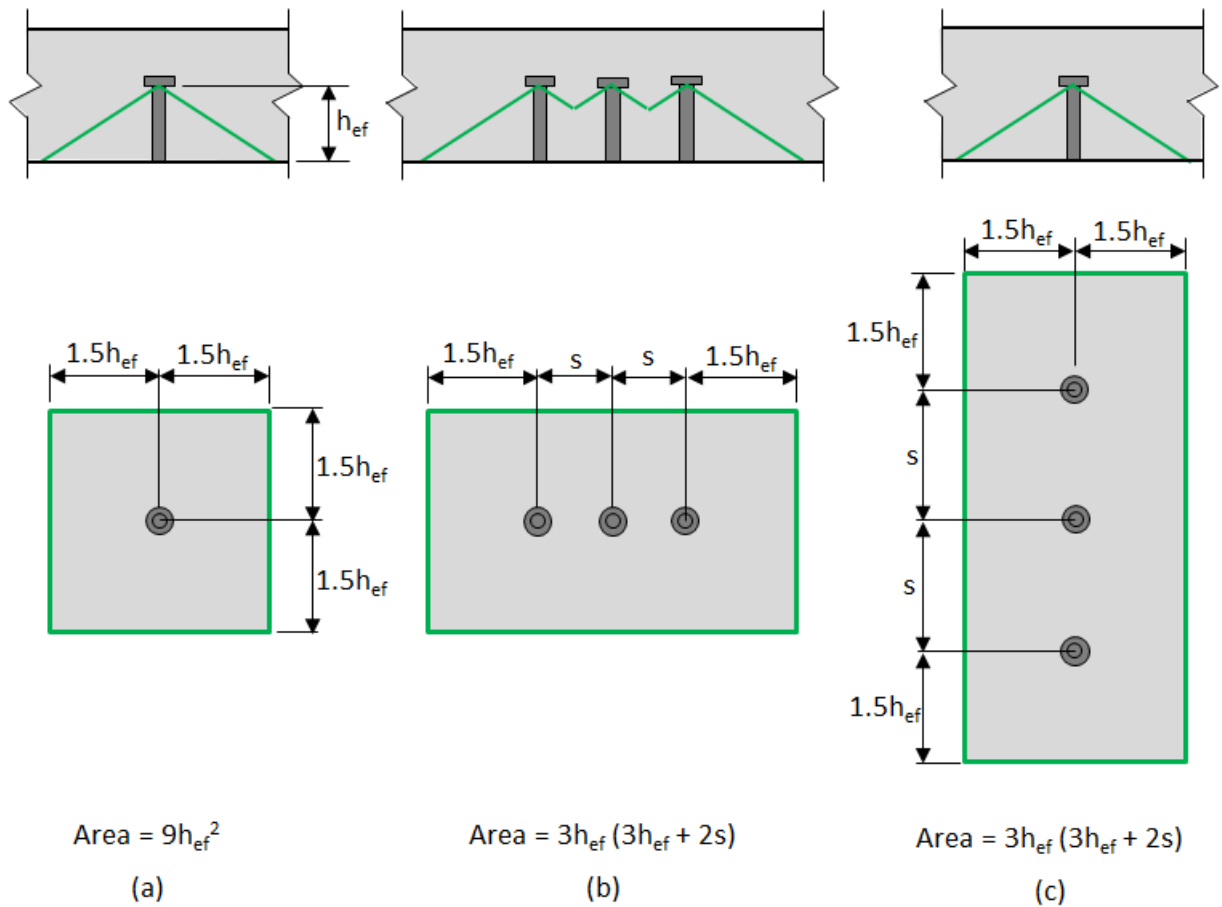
Dimensioned Projected Concrete Cone Failure Areas for (a) 1 Stud (b) 3 studs Spaced Transversely (c) 3 Studs Spaced Longitudinally, all without a Haunch
